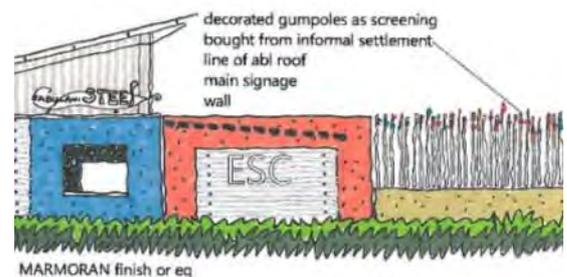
(Right) Part of design elevation from architect. The architect proposed using local materials and crafts to anchor the project to the context and involve the community. (John Royal Architects)
